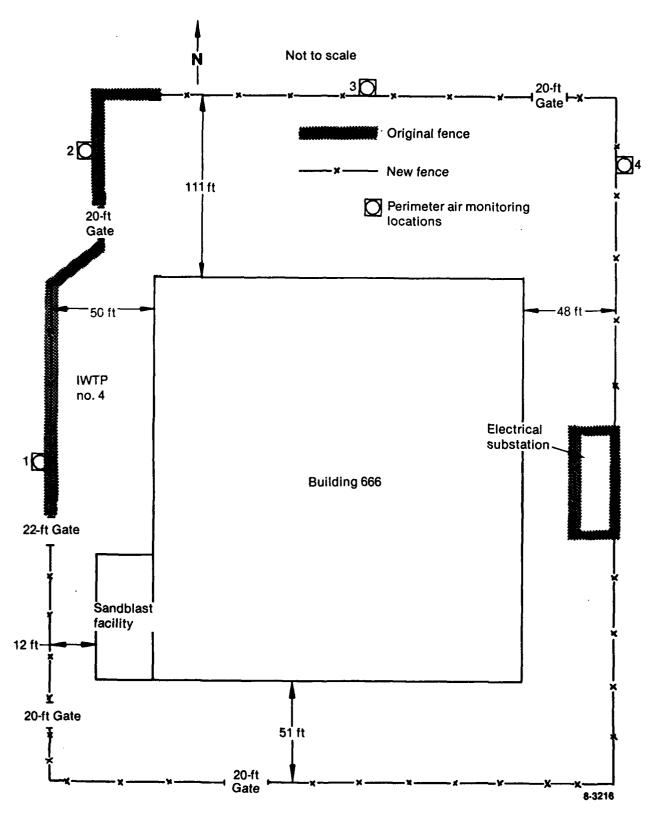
Building 666/IWTP No. 4 facility showing location of perimeter fence and gates.
